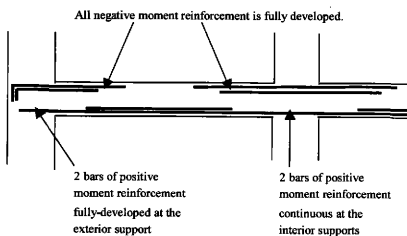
Details of Beam Reinforcement for Study Building [Adapted from ACI 318-83 (1983)]
